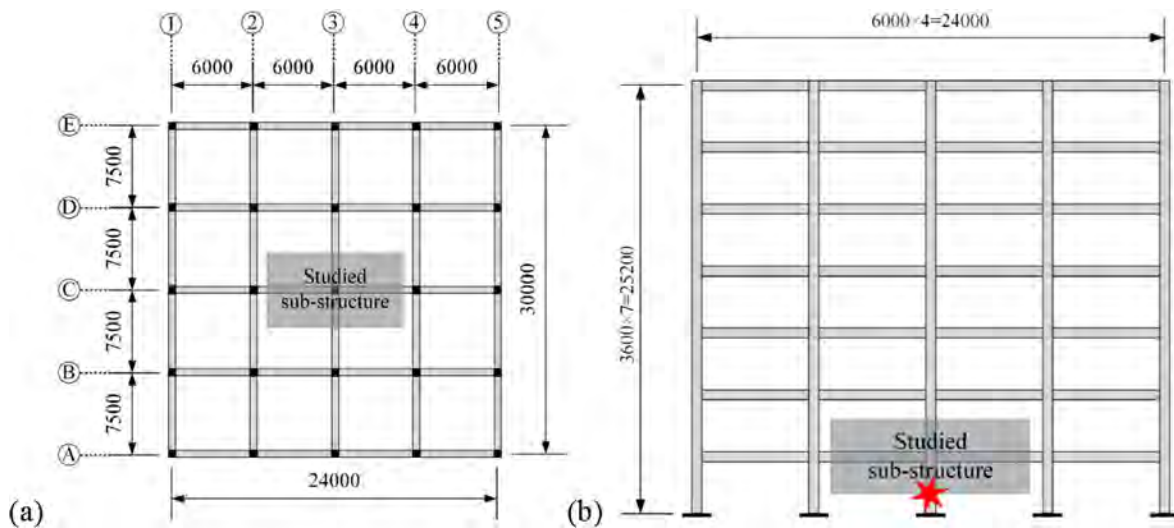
Details of prototype building: (a) plane view; (b) elevation view (unit: mm).
